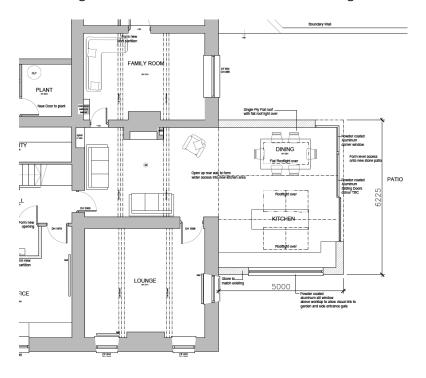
Revised Scheme – 6.2m in width addresses footprint of existing conservatory and respects existing building
